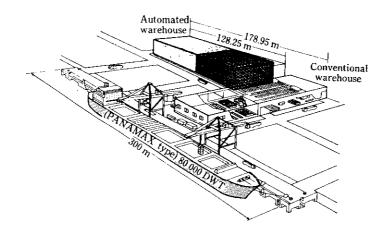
Conceptual design of the new material handling facilities at Chiba Works
